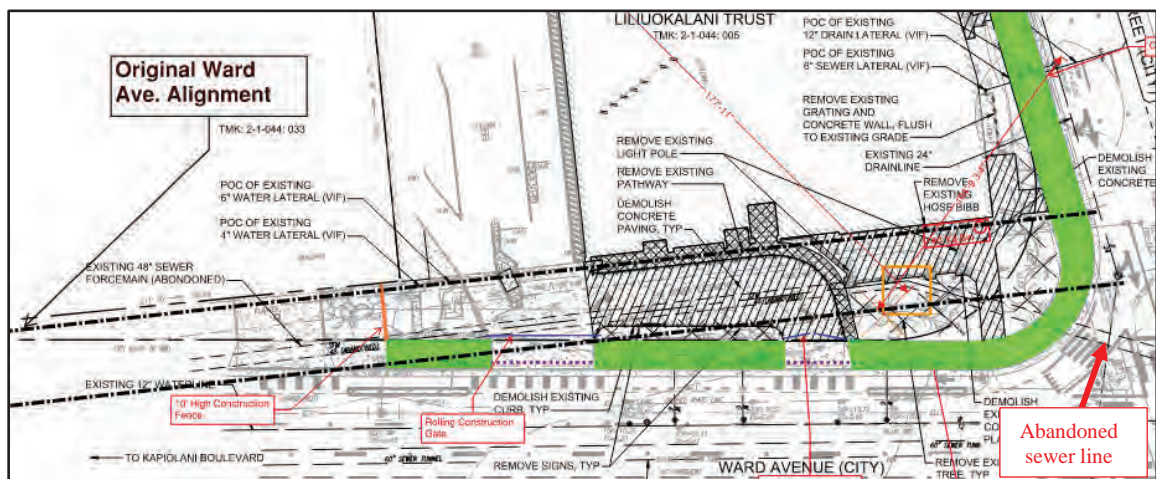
Portion of client-supplied Existing Condition and Demolition Plan with overlay of former Ward Avenue alignment in relation to the tower crane location
